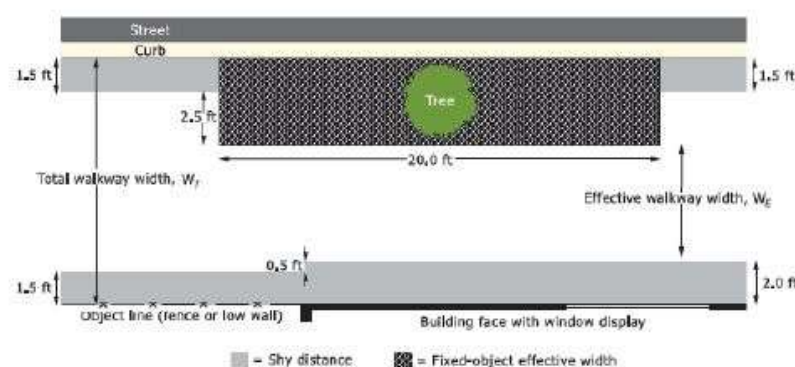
Instructions for calculating effective sidewalk width (Source: HCM 2010 Exhibit 17-17)
